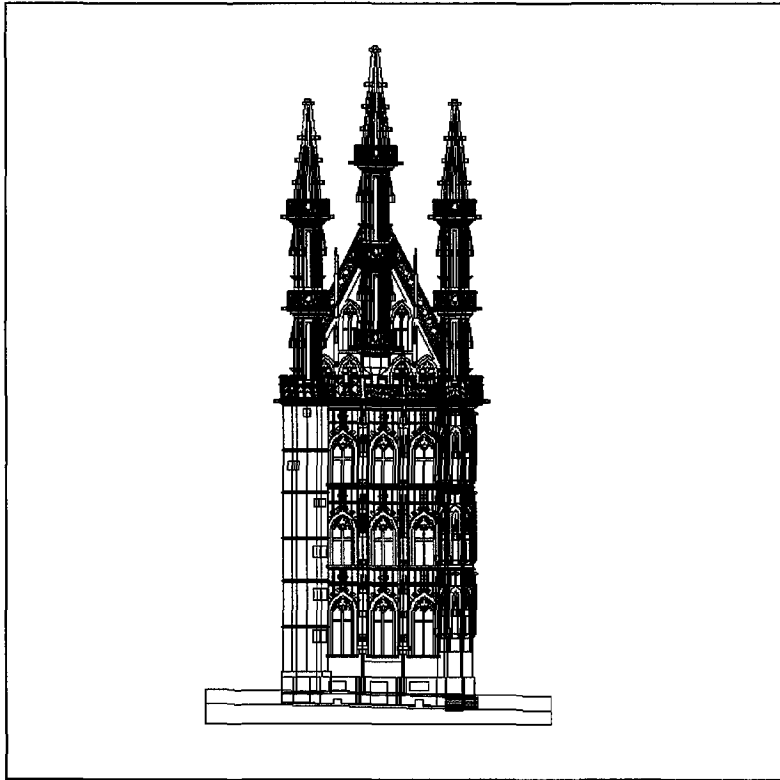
east elevation of the town hall in Leuven. Note the asymmetry, caused by the lower left tower drum, provoking eccentric positions of the gable and the corner towers as well.
